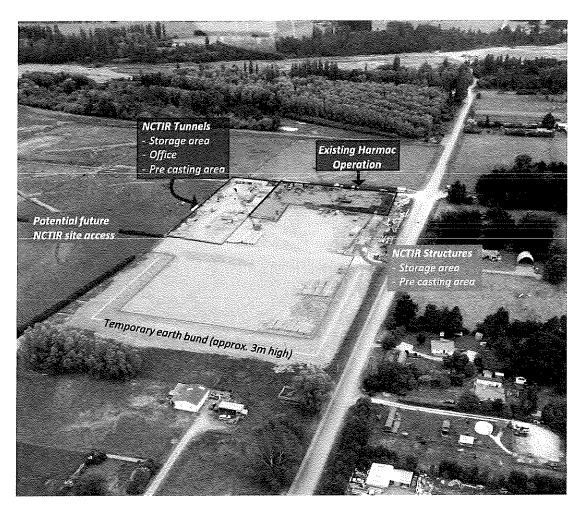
YARD LAYOUT - INDICATIVE AREAS
